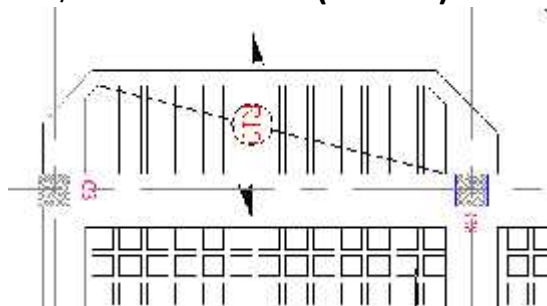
One Way Rib slab-cantilever (R19-part B)
